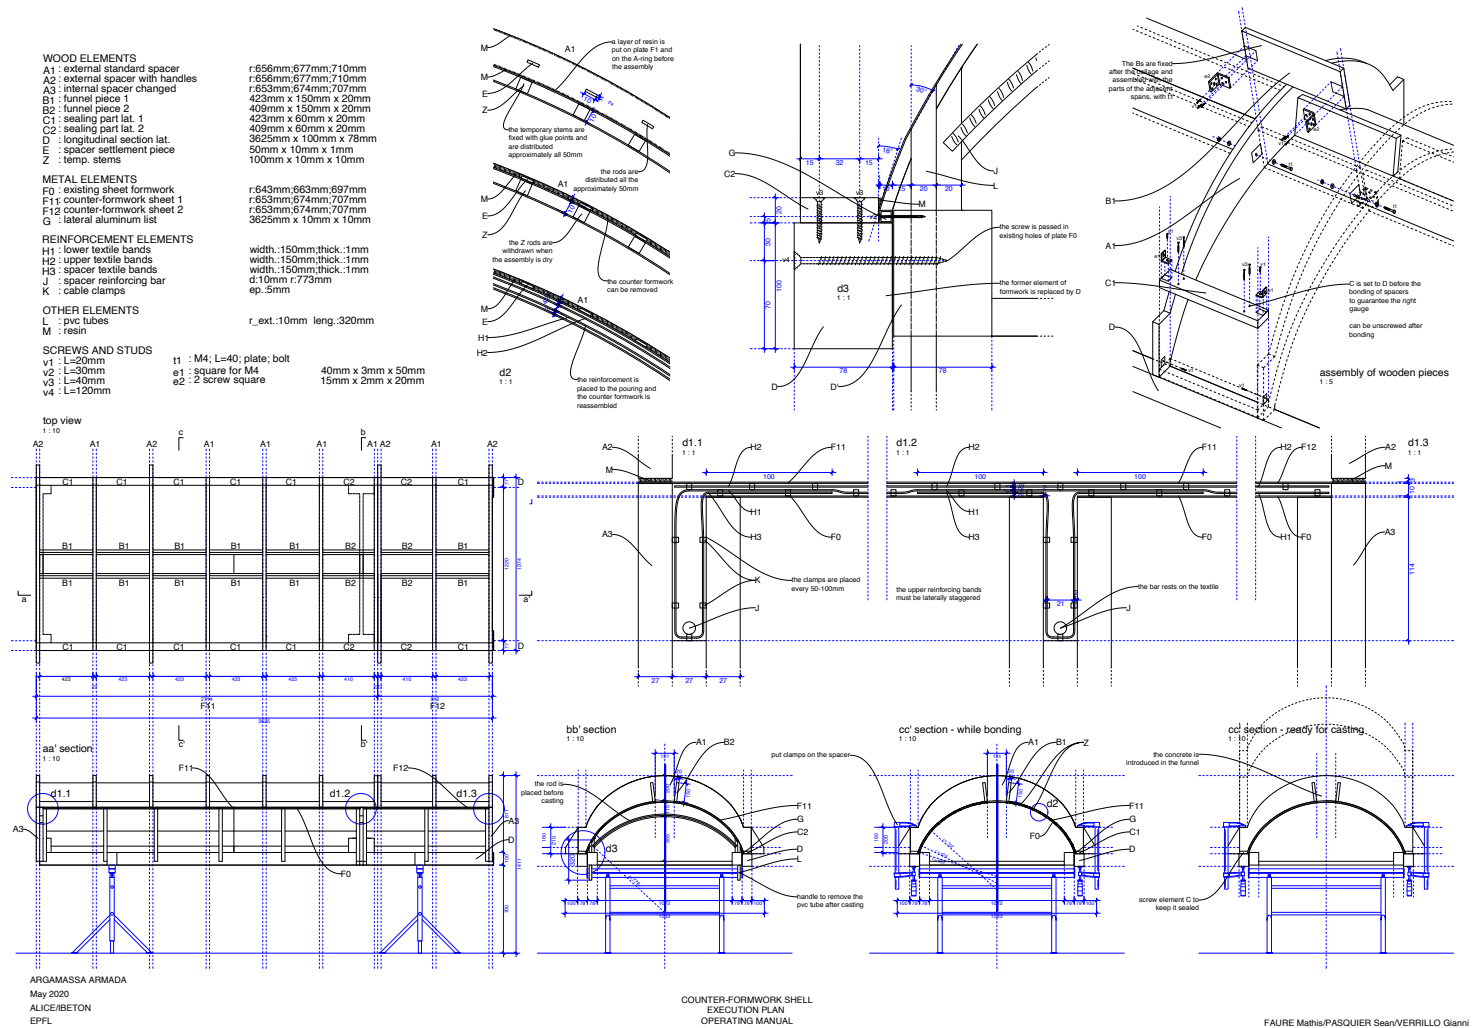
Drawing of upper part of mold of barrel shell vault, sheet 1, 2020
